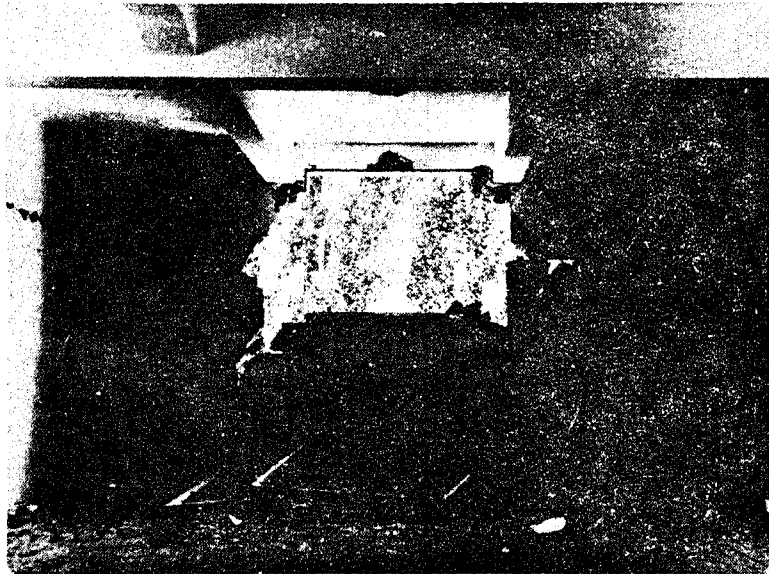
Melosas Summer School Camp. Second floor wall destroyed by shear stresses.
